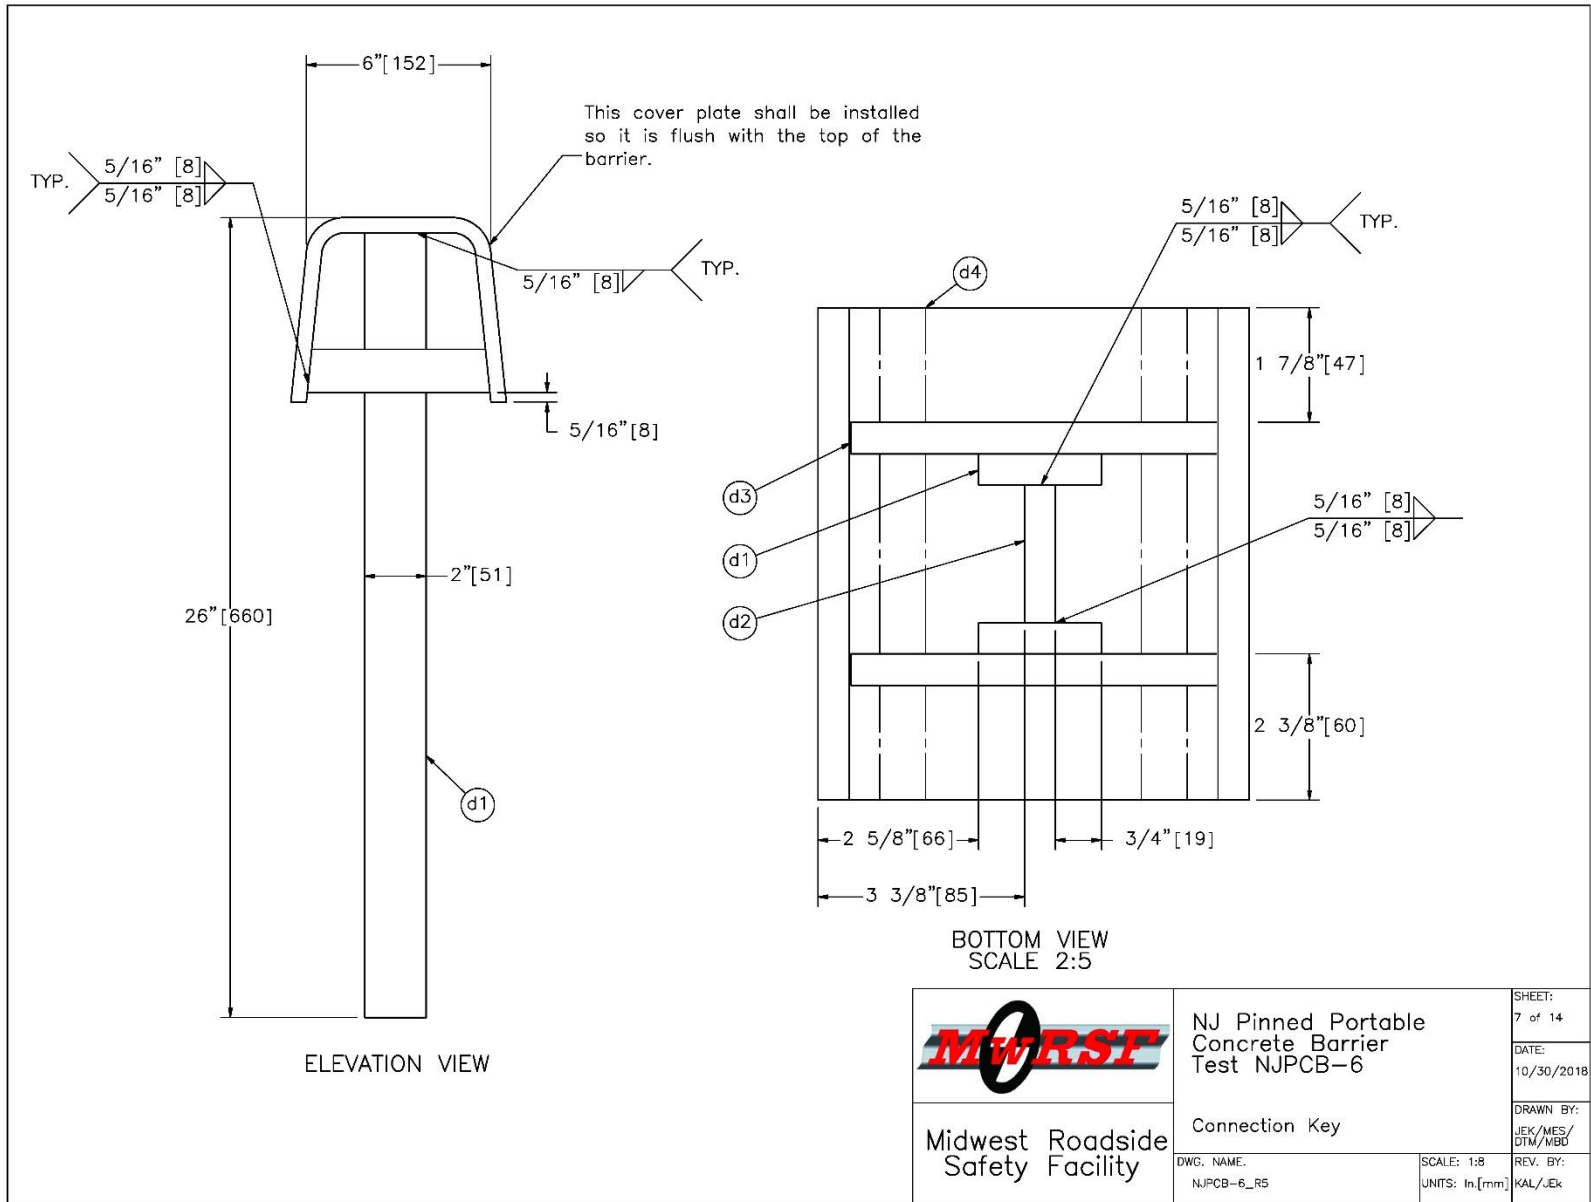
PCB Connection Key Assembly Details, Test No. NJPCB-6
